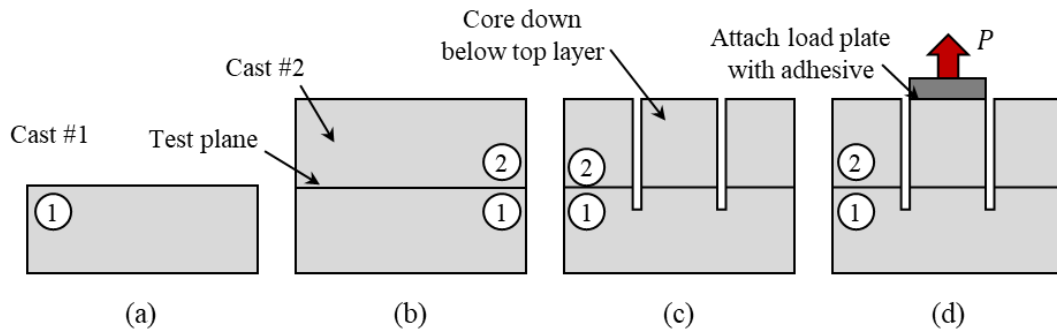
Casting and testing procedure for alternate pull-off test: (a) casting of first layer, (b) casting of second layer, (c) core through top layer into bottom layer, and (d) attach load plate and apply tensile force to failure (designated by P)
